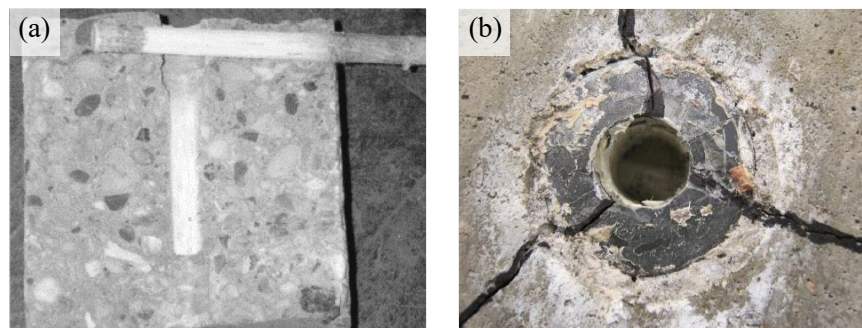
(a) Pullout failure (Achillides and Pilakoutas, 2004) and (b) Splitting cracks (Vint, 2012).
